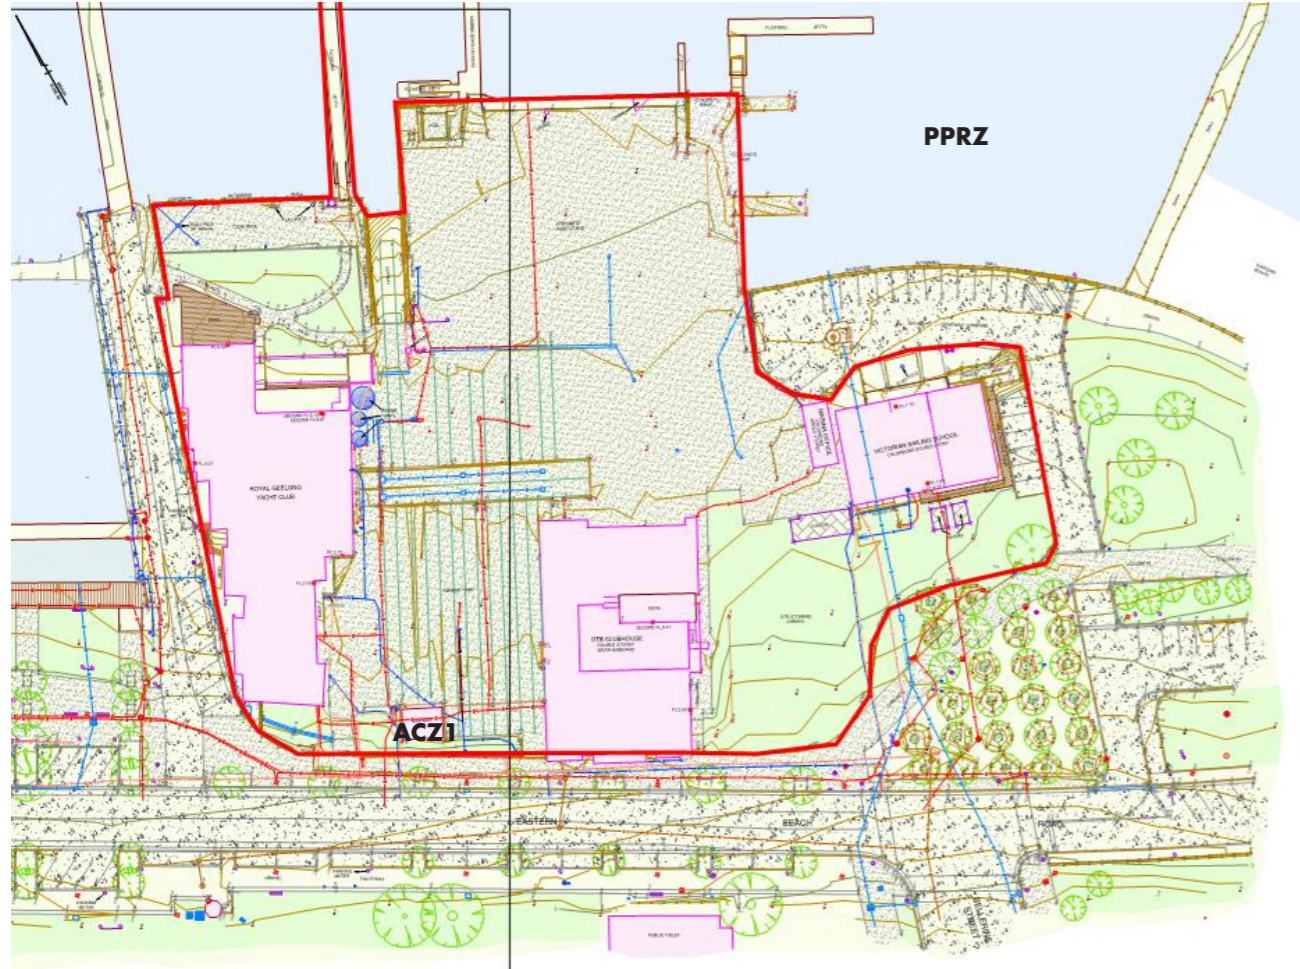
Site Parcel Plan (extract from St. Quentin drawing 15011 - Plan of Feature and Level Survey)
